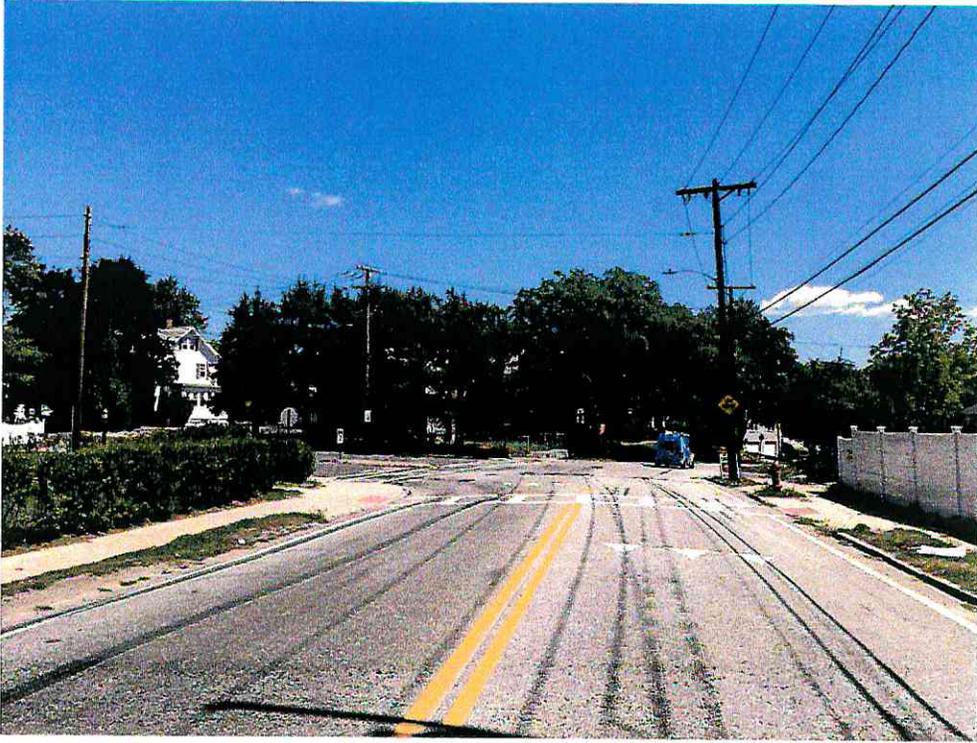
Location m – Cross St. looking east. 160' west of Lowell Ave.
